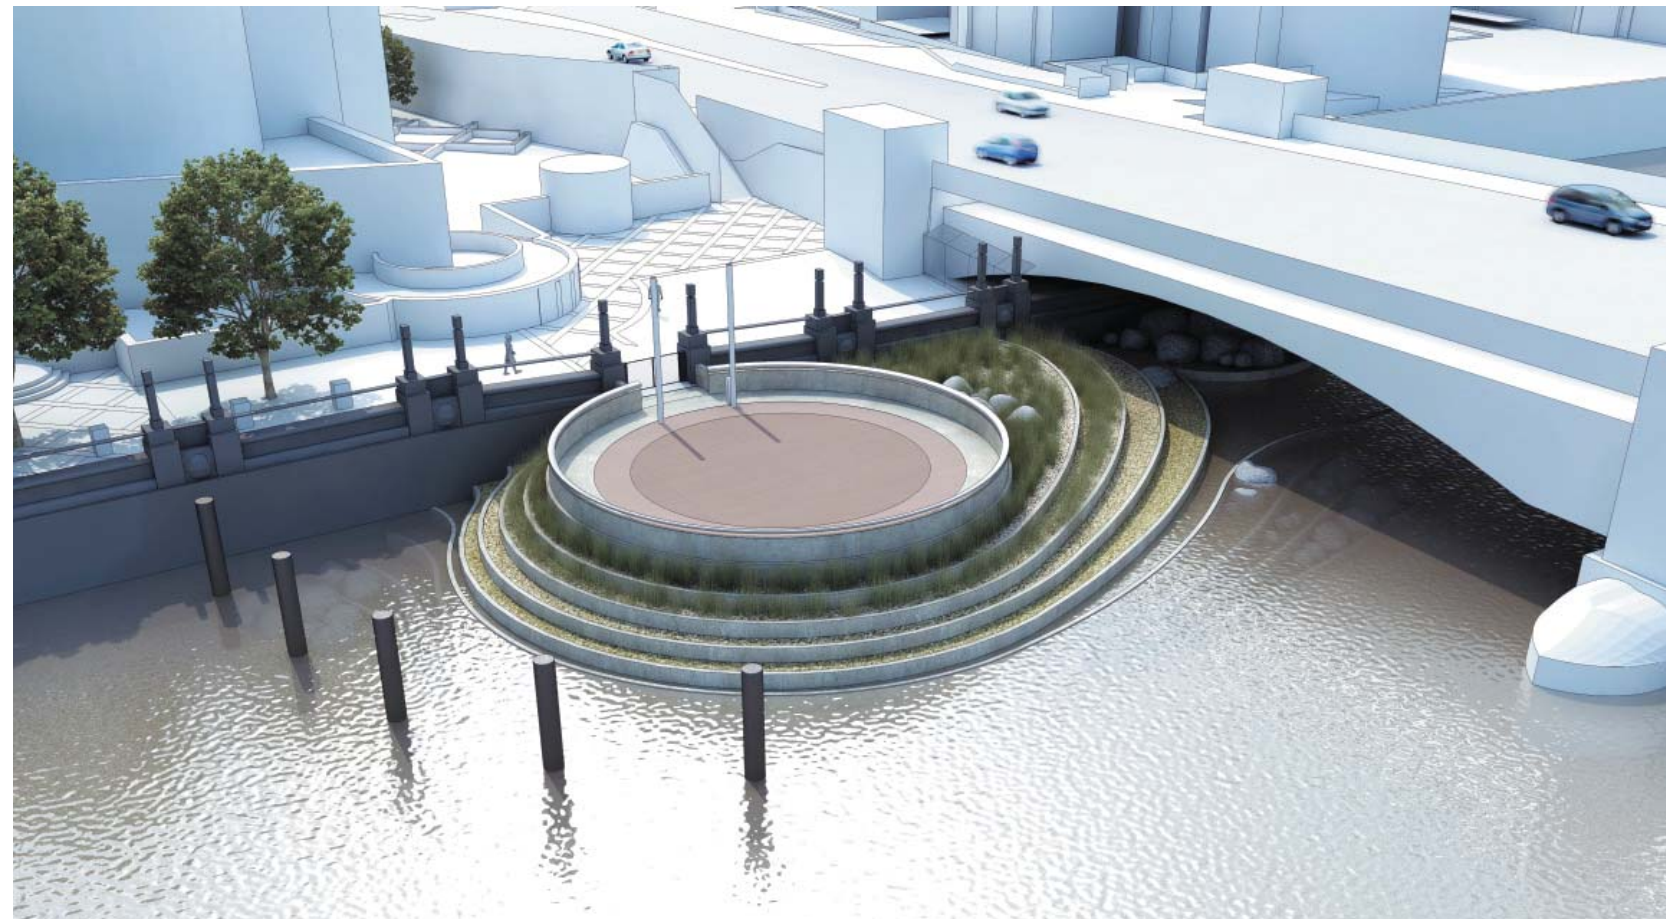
Proposed view of CSO interception structure downstream of Vauxhall Bridge
